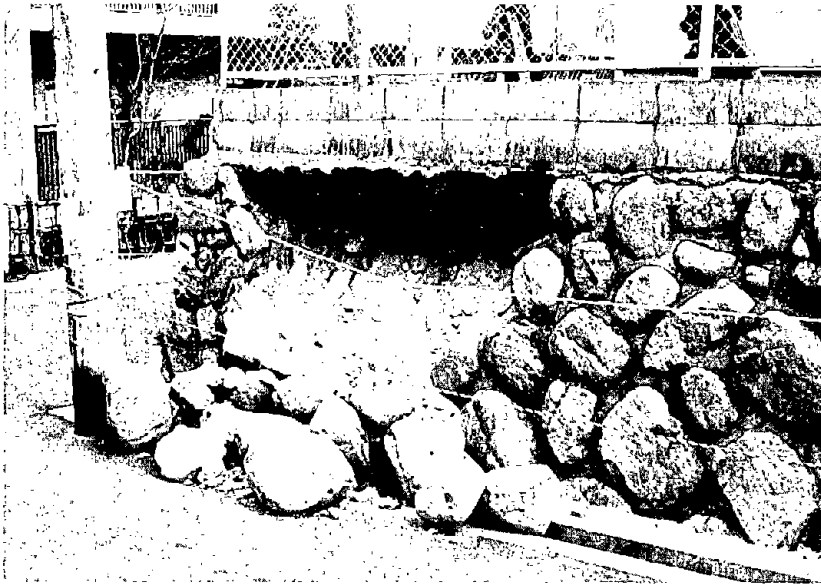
Typical failure of a stone retaining wall in a residential area.
